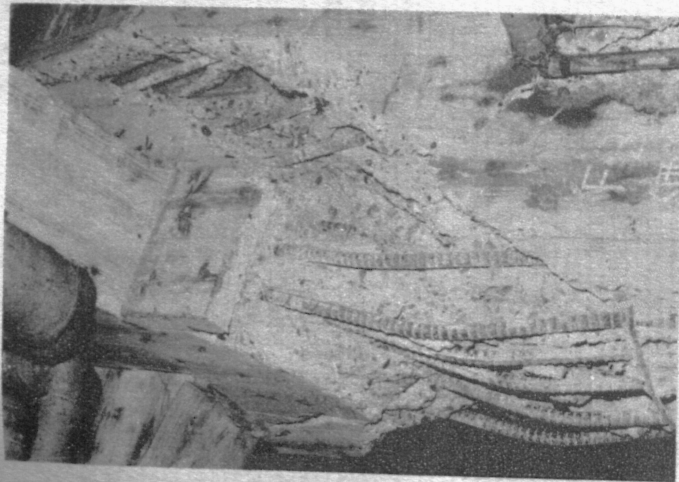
Detail of damage to the top of the interior long-column of the first story at coordinates F-3. Note that few ties can be seen.
